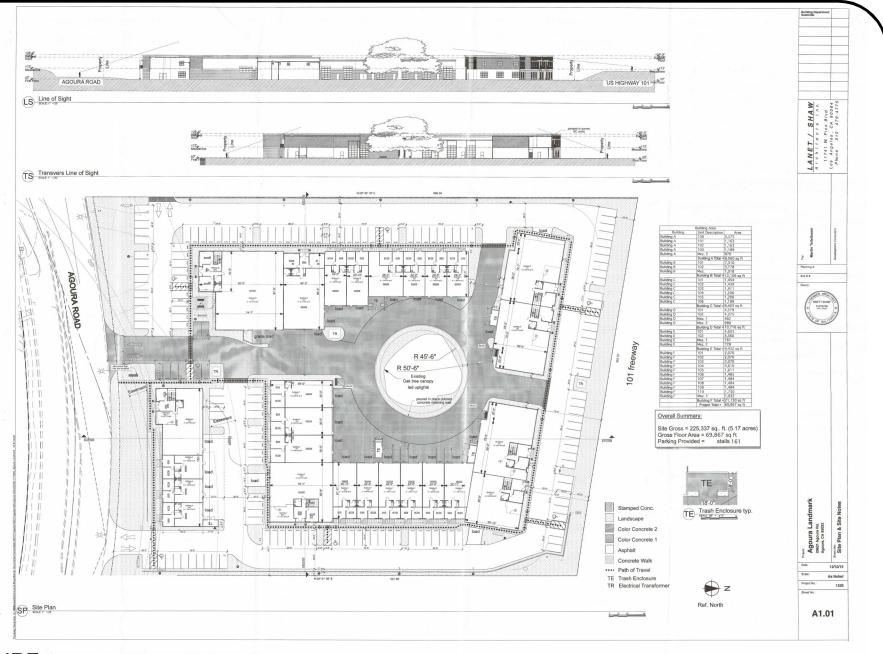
LANDMARK DEVELOPMENT PROJECT SITE PLAN
